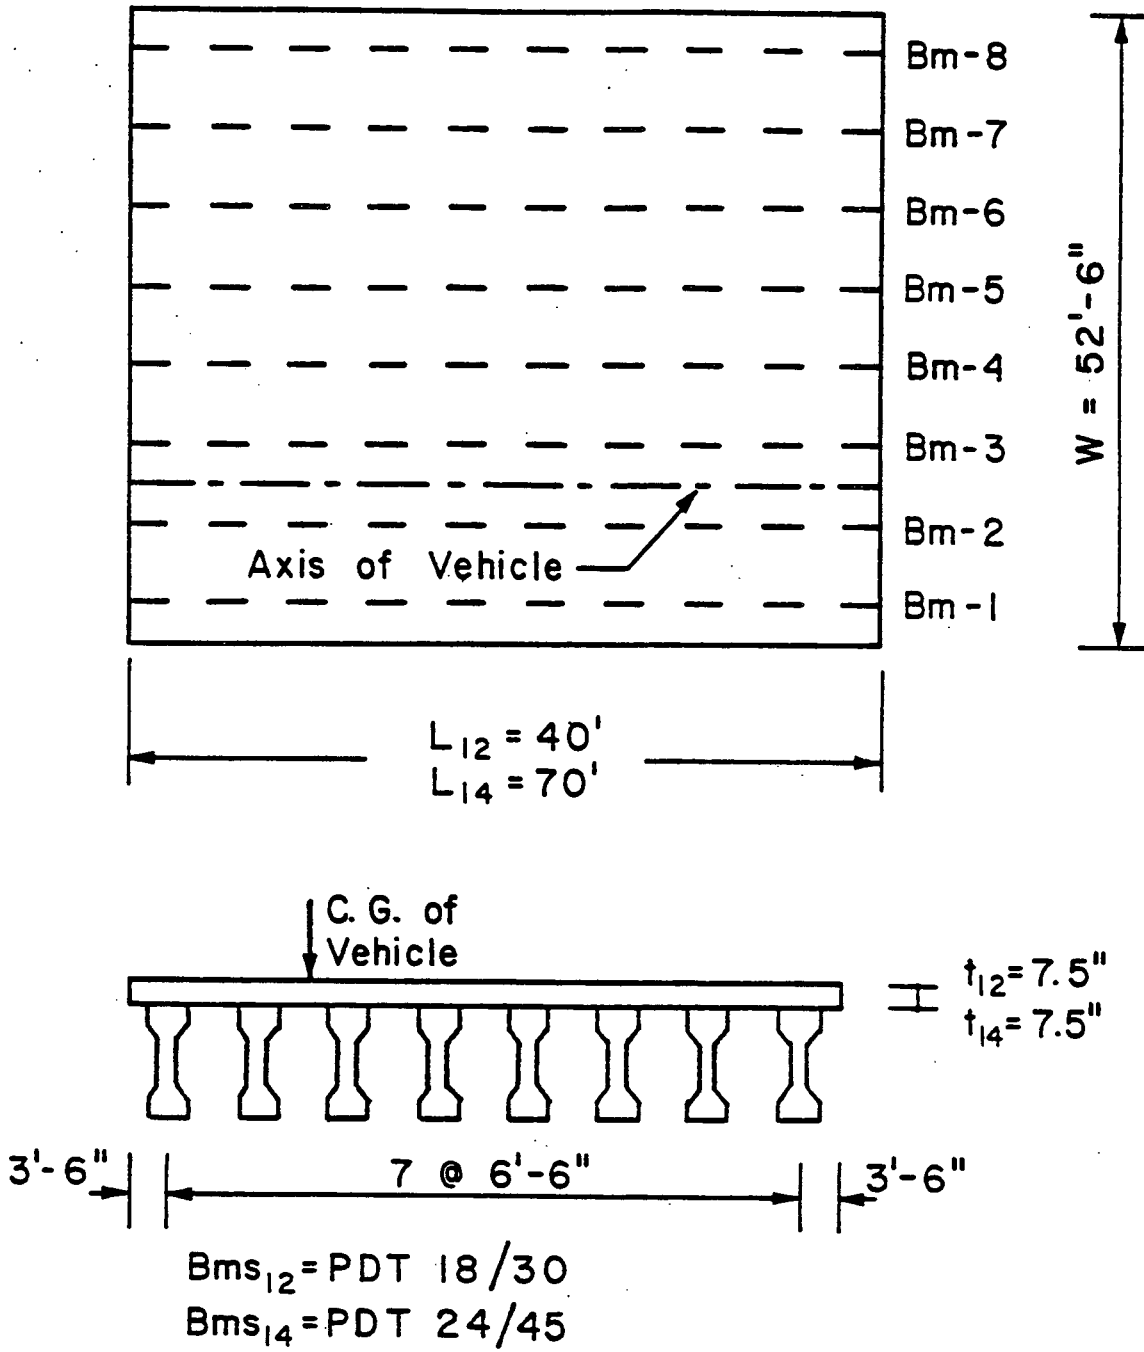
Plan and Cross-Section of Bridges 12 and 14
